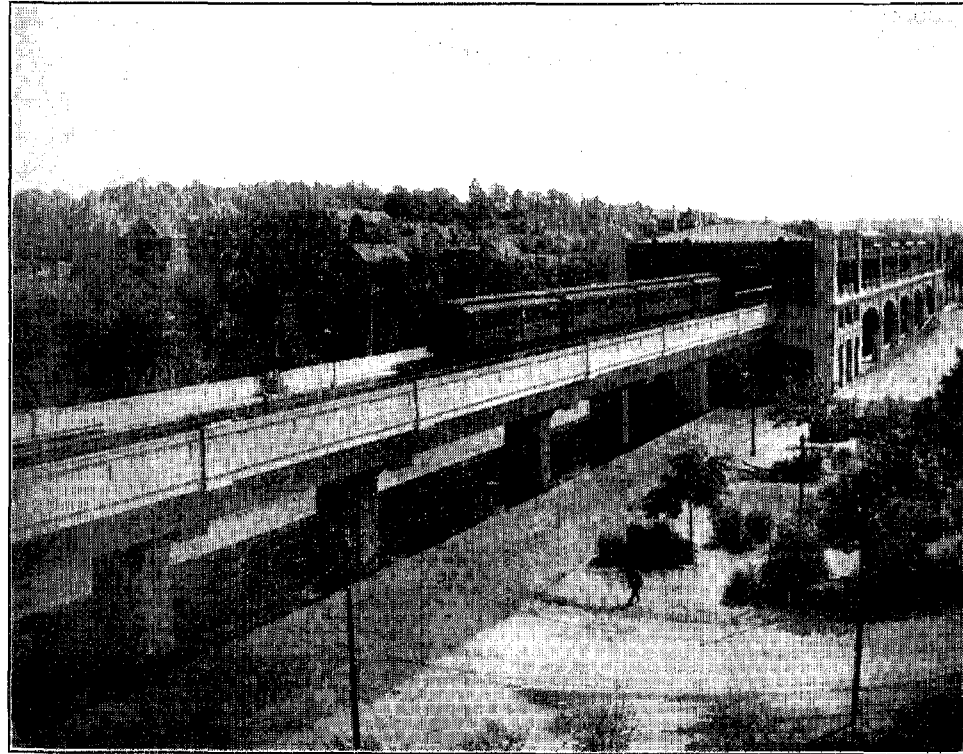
Concrete elevated structure at Forest Hills, Boston.
